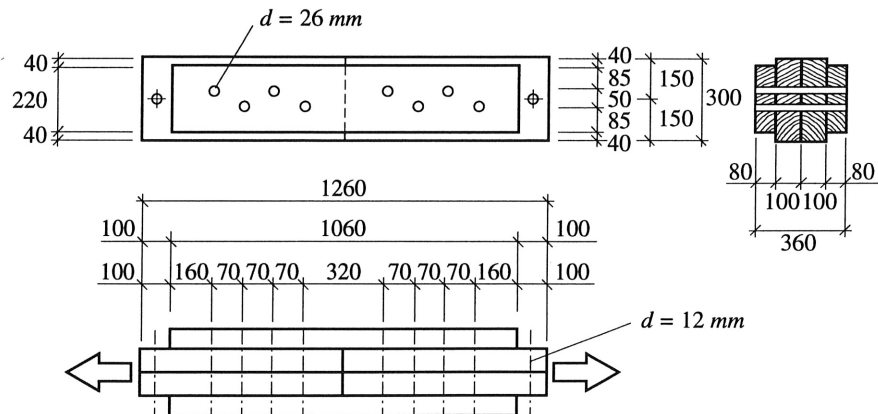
Tensile joint with side members of wood and dowels in double shear.
